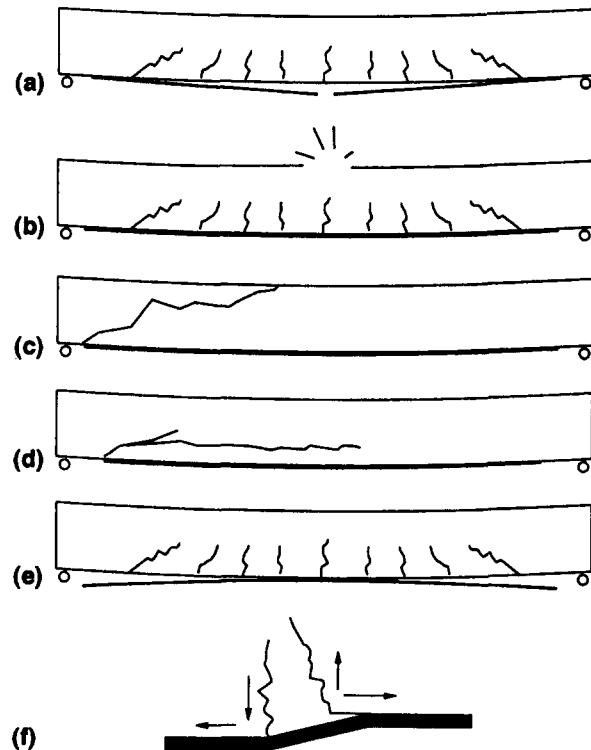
Failure Modes in FRP Retrofitted Concrete Beams: (a) Steel Yield and FRP Rupture; (b) Concrete Compression Failure; (c) Shear Failure; (d) Debond of Layer along Rebar; (e) Delamination of FRP Plate; (f) Peeling due to Shear Crack
